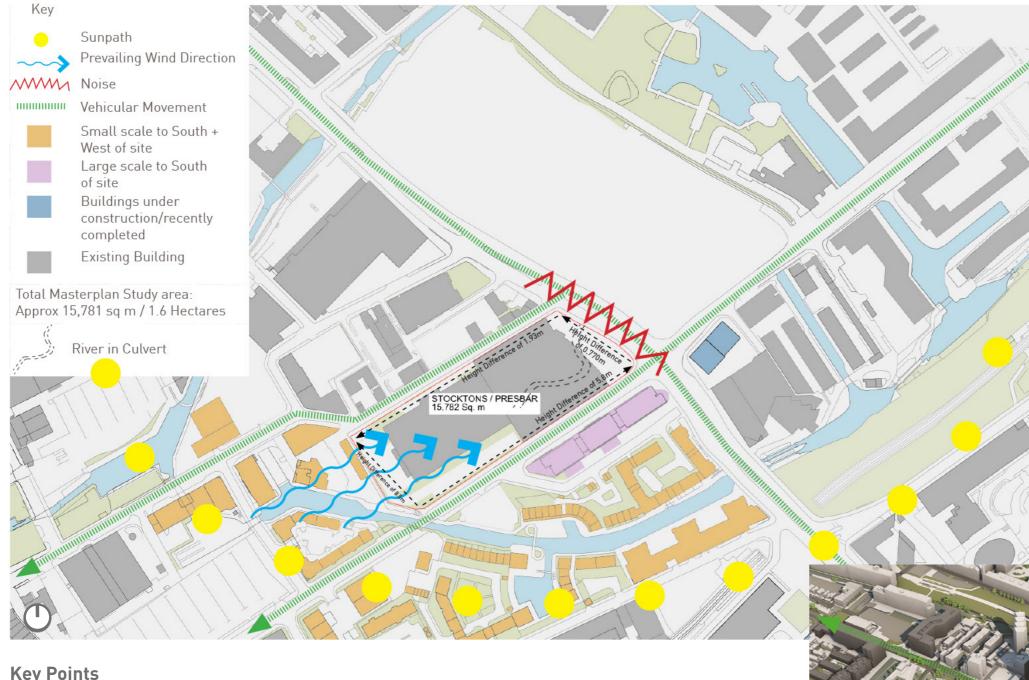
Left: Plan of the site illustrating the existing condition and summarising the constraints
